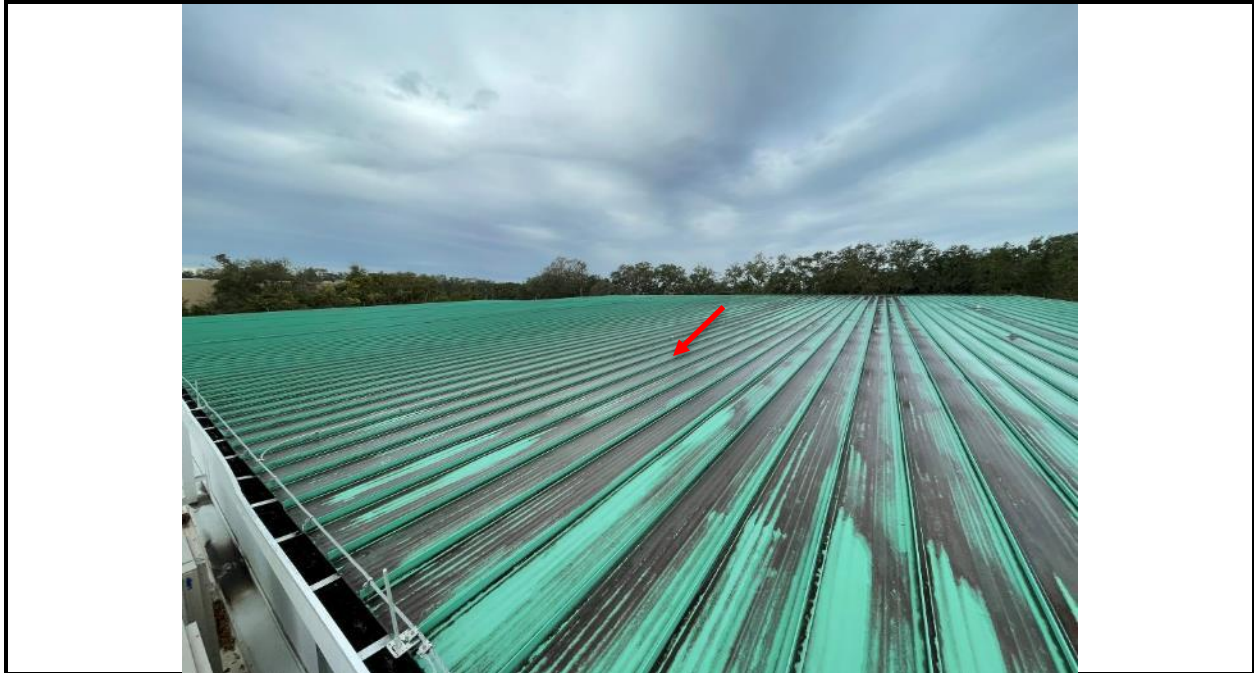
The roof systems associated with the building appeared to consist of a combination of standing seam metal roof panels (over the original construction) and single-ply membrane (TPO or PVC) over the additions.
